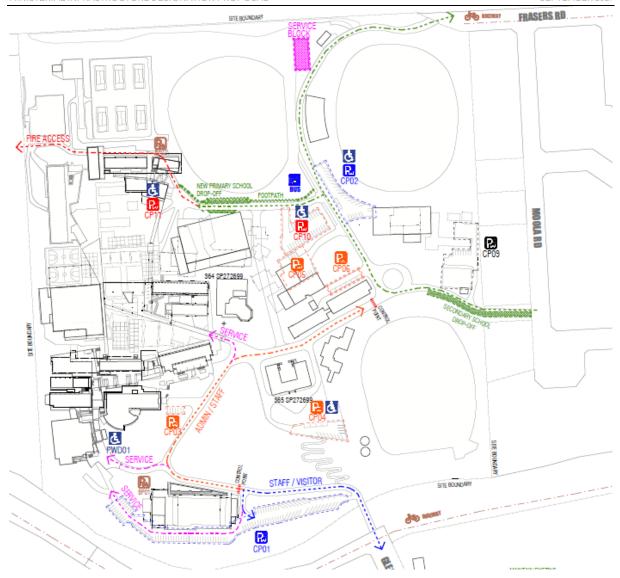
Proposed Vehicular Routes and Car parking within the College.
